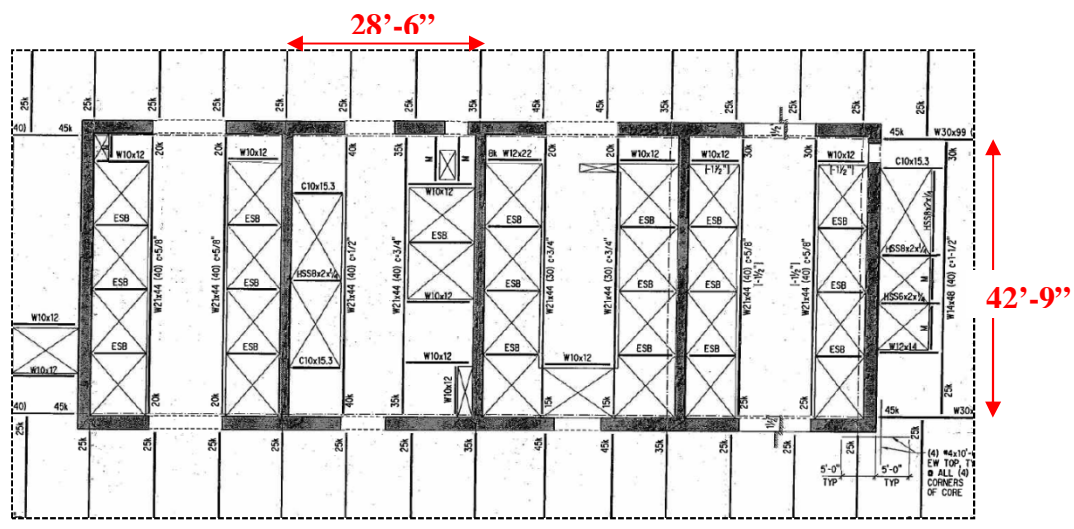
Shear wall layout (300 North LaSalle, Chicago, IL – 60 story, provided by Magnusson Klemencic Associates, 2006)
